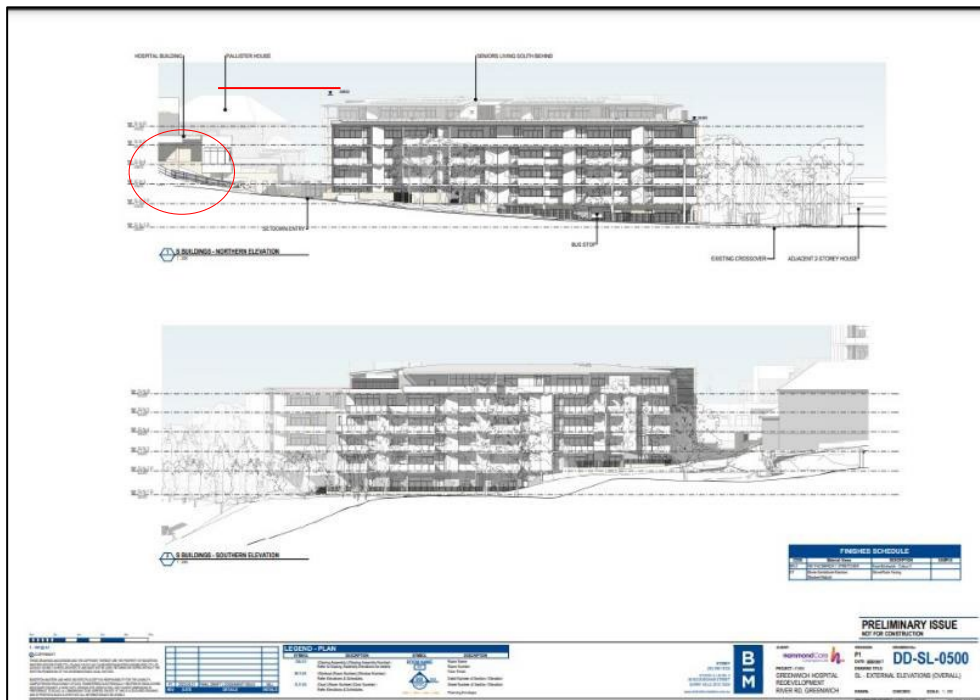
Seniors Living South and North elevation Red line showing roof line in comparison to Pallister House and circle showing the terraced design in proximity to Pallister House
